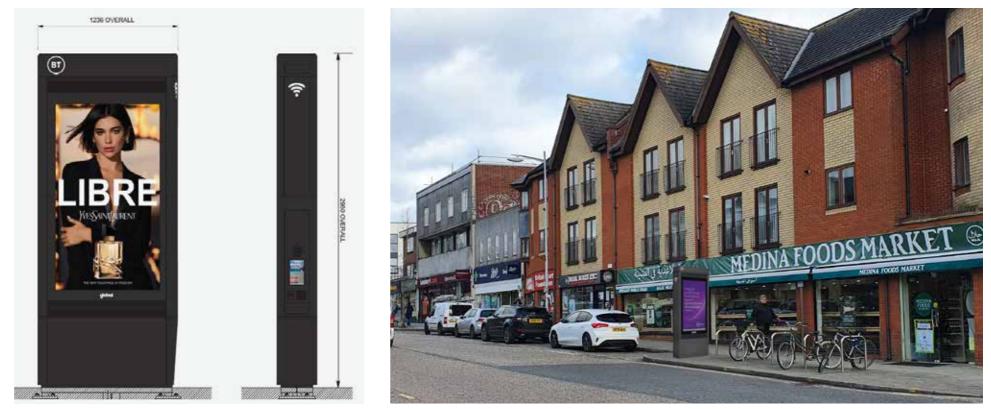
BT Street Hubs - mock up of Hub (left) and visualisation on London Road (right) (Source: planning application)
